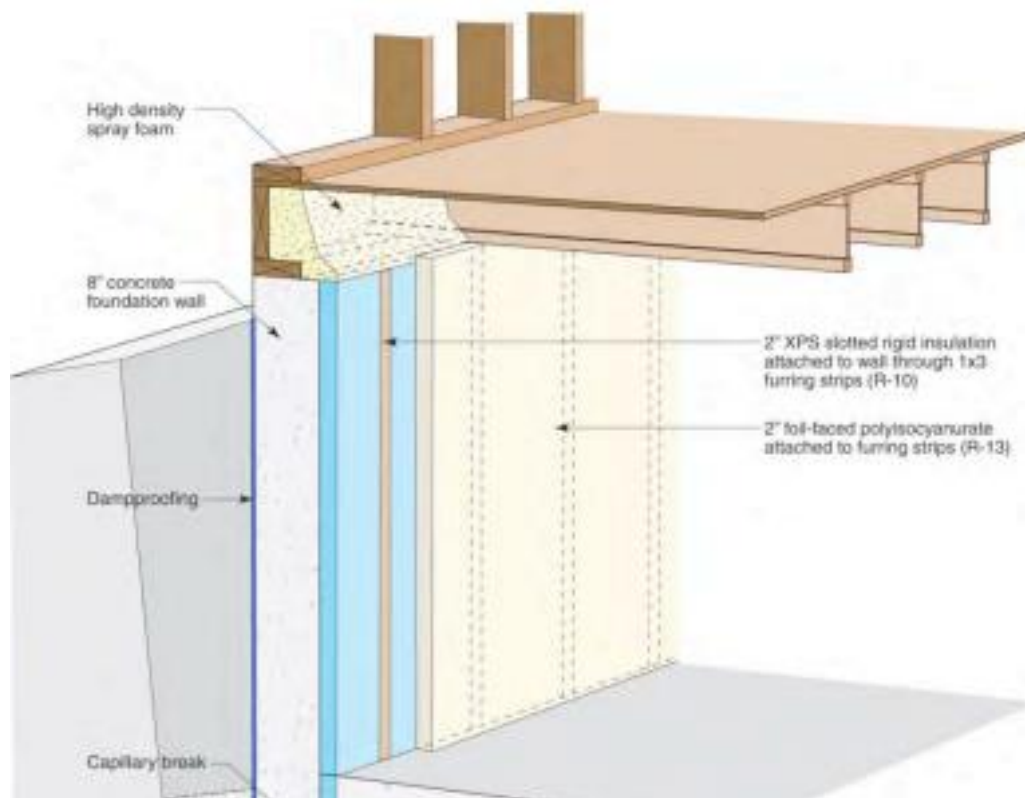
Foam board on interior of foundation wall (Straube and Smegal, 2009)
